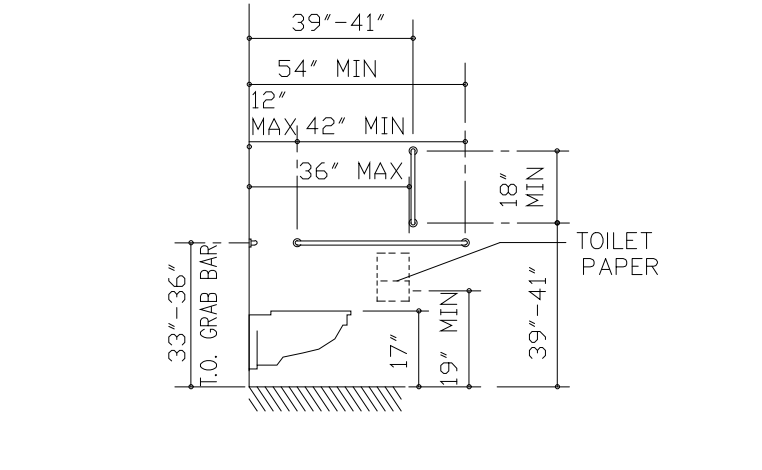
SIDE WALL OF STANDARD TOILET STALL
